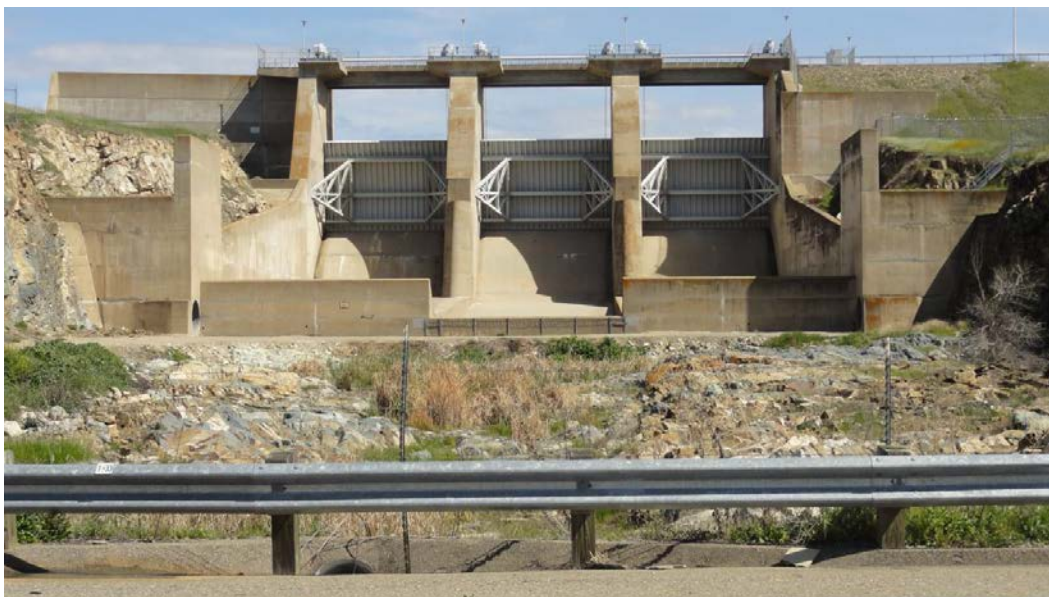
Don Pedro spillway gate structure viewed from downstream.
